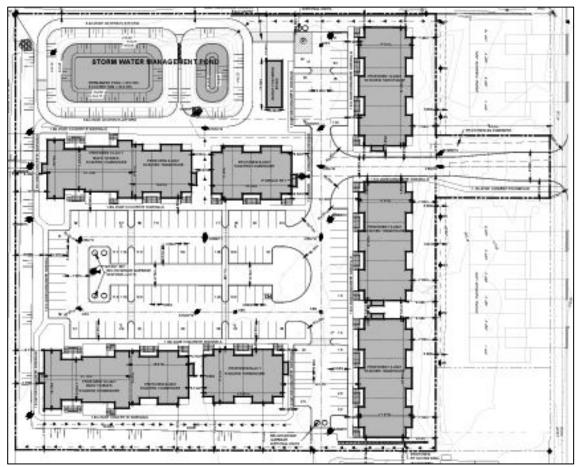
Proposed Site Plan prepared by Cobide Engineering Inc., August 2024.
